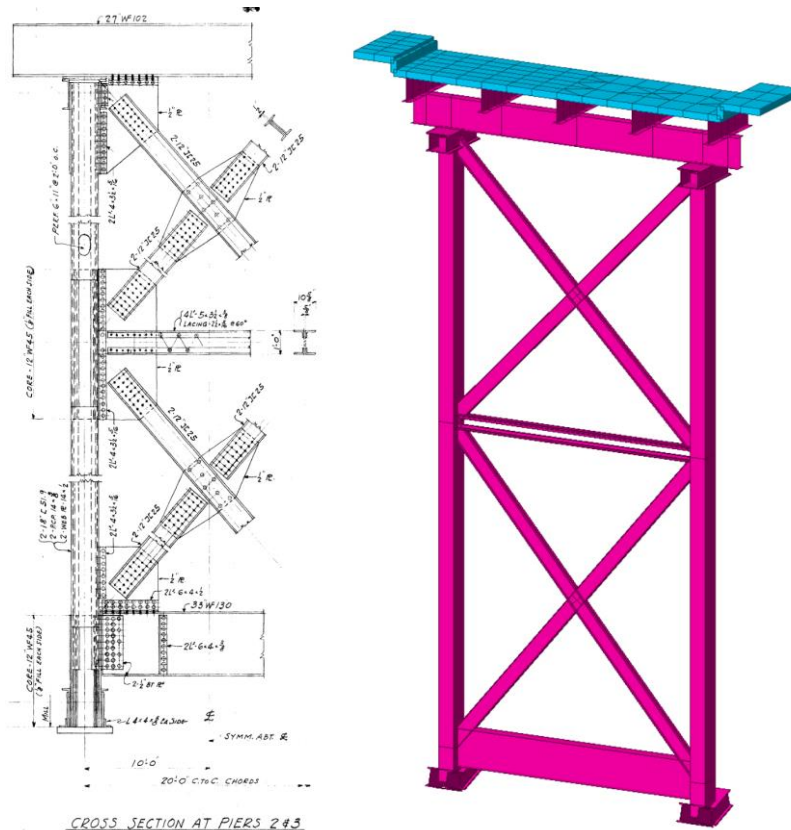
View of cross section at piers: technical drawing (left) and FE model (right) - Truss_3.
